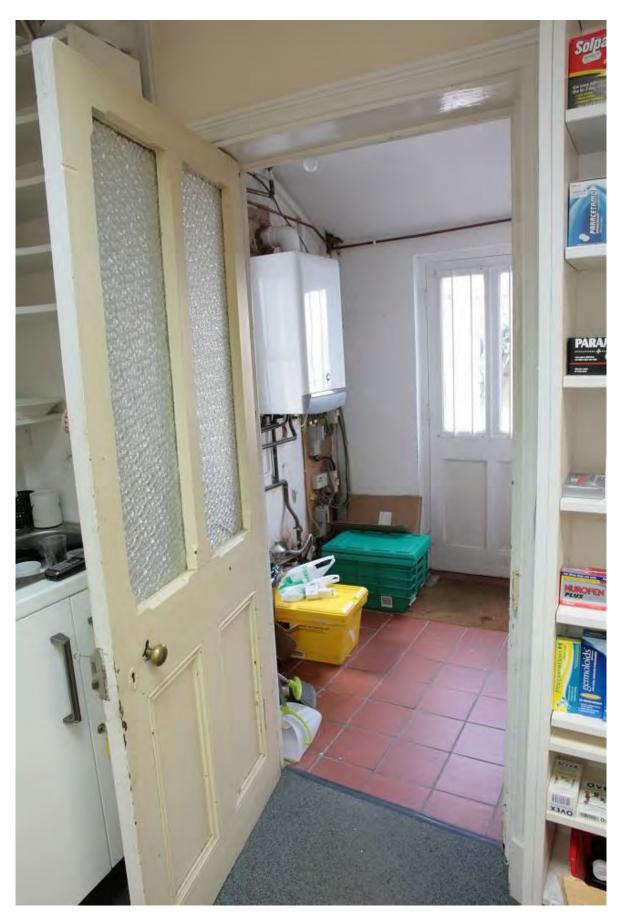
Rear Lobby viewed from Staff Area of Sales Room, looking west (LMSC16 D100 (36))
